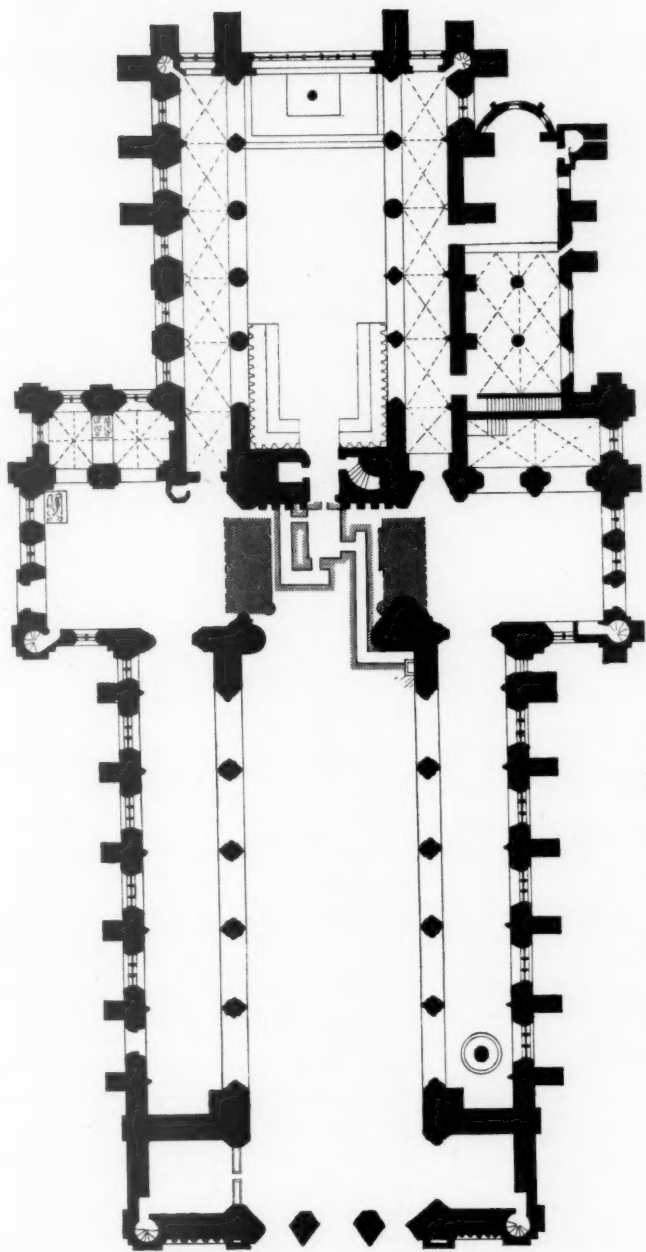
Plan of Ripon Minster, showing foundations in north and south arches of crossing.
